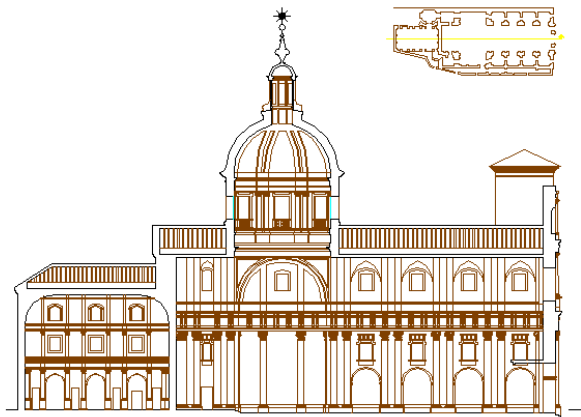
Cross-Section of San Ildefonso's Church in Toledo
